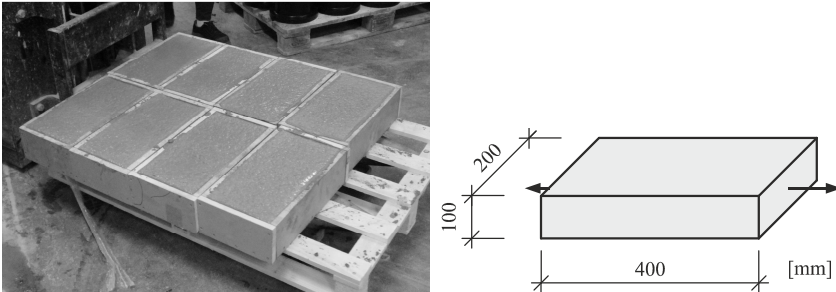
Placed and compacted concrete in horizontal formwork (left) and dimensions of specimens (right)
